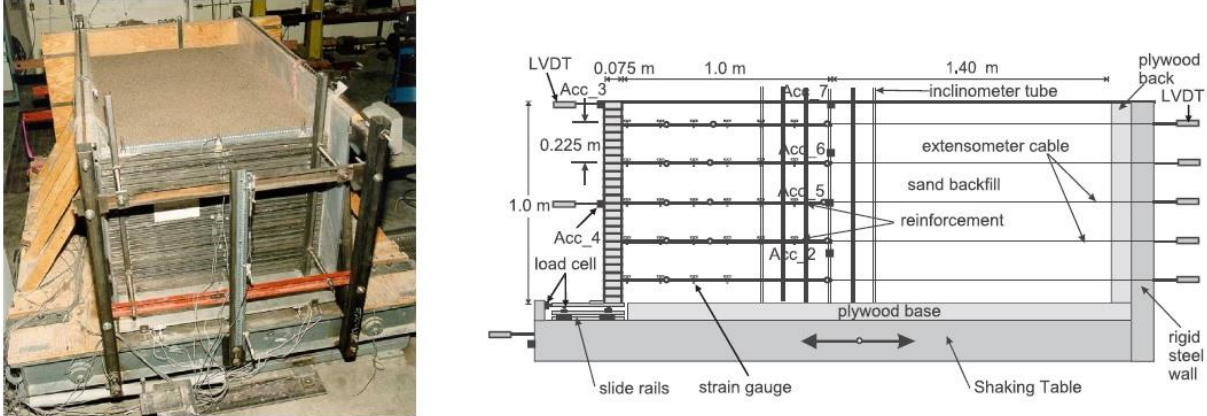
Reduced scale reinforced soil model wall and instrumentation layout (El-Emam, 2018)
